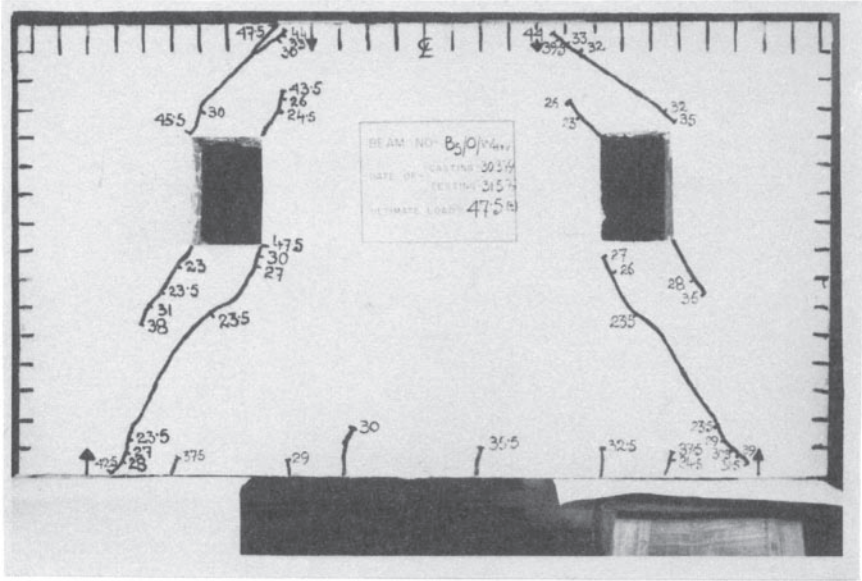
Crack patterns at failure of a typical deep beam with rectangular web openings (under two-point loading)
